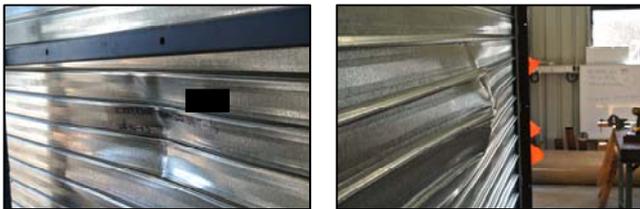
Impact location next to panel joint: front view (left); rear (right).
